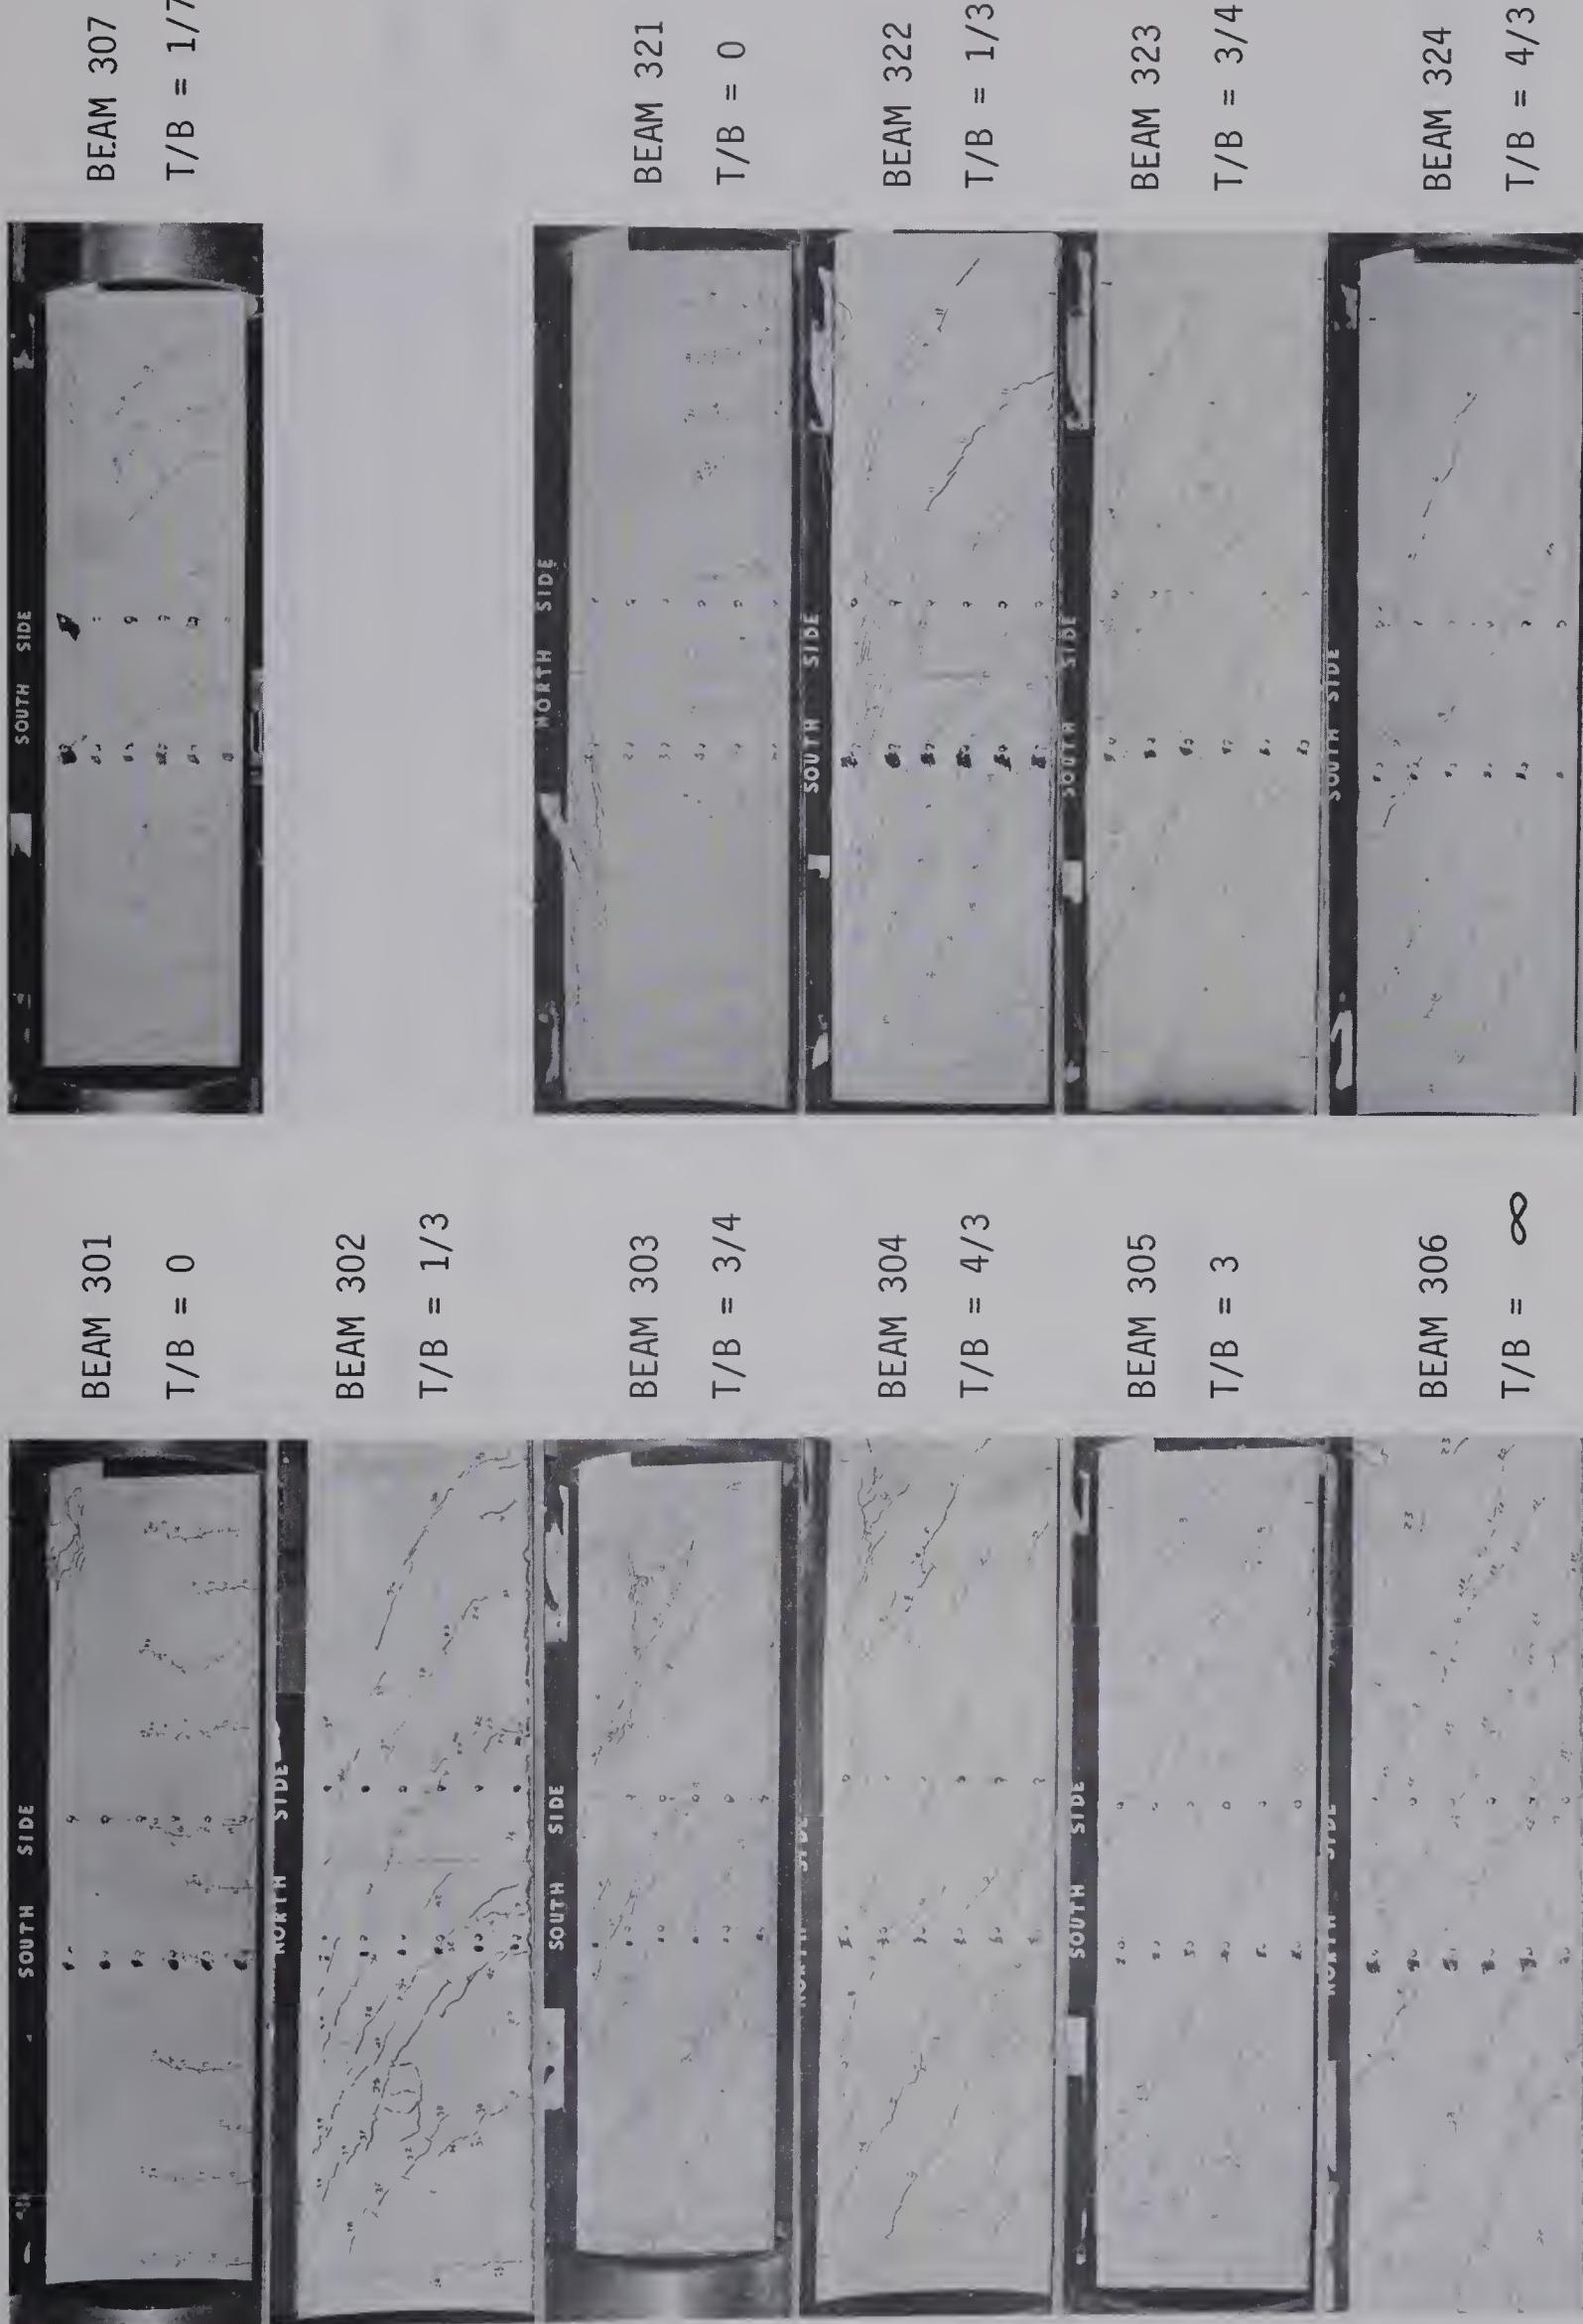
CRACK PATTERNS (BEAMS 301 to 307) AND (BEAMS 321 to 324)
